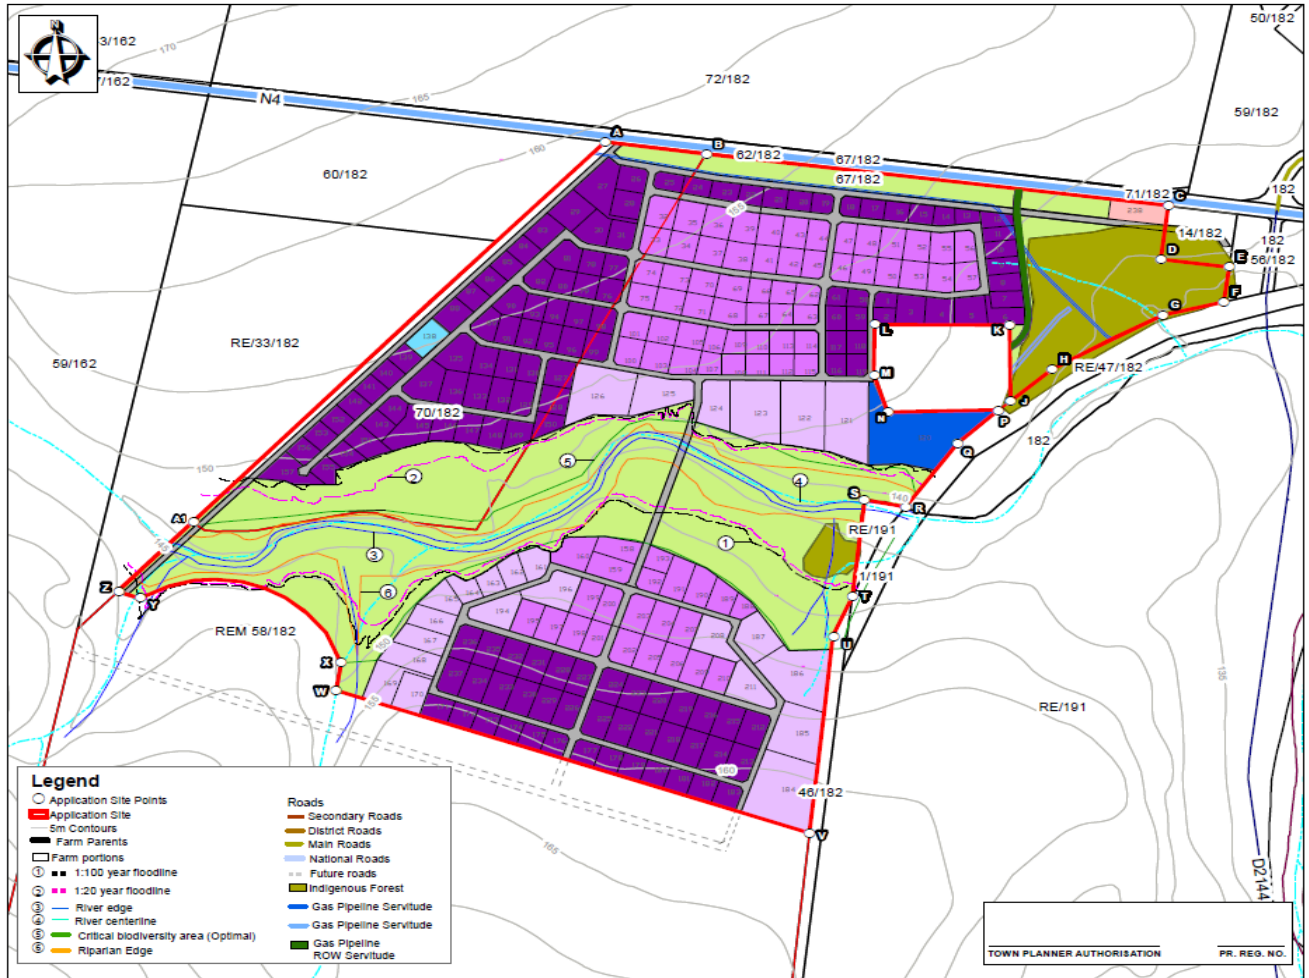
Site Town Planning Layout (excluding Logistics Hub)
